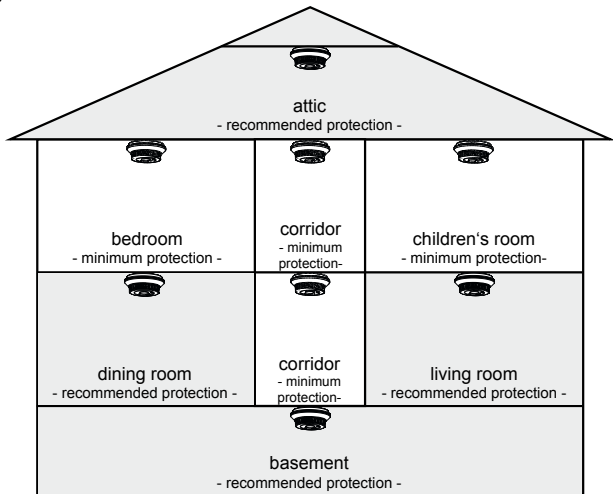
Mounting smoke alarms - minimum and recommended protection
